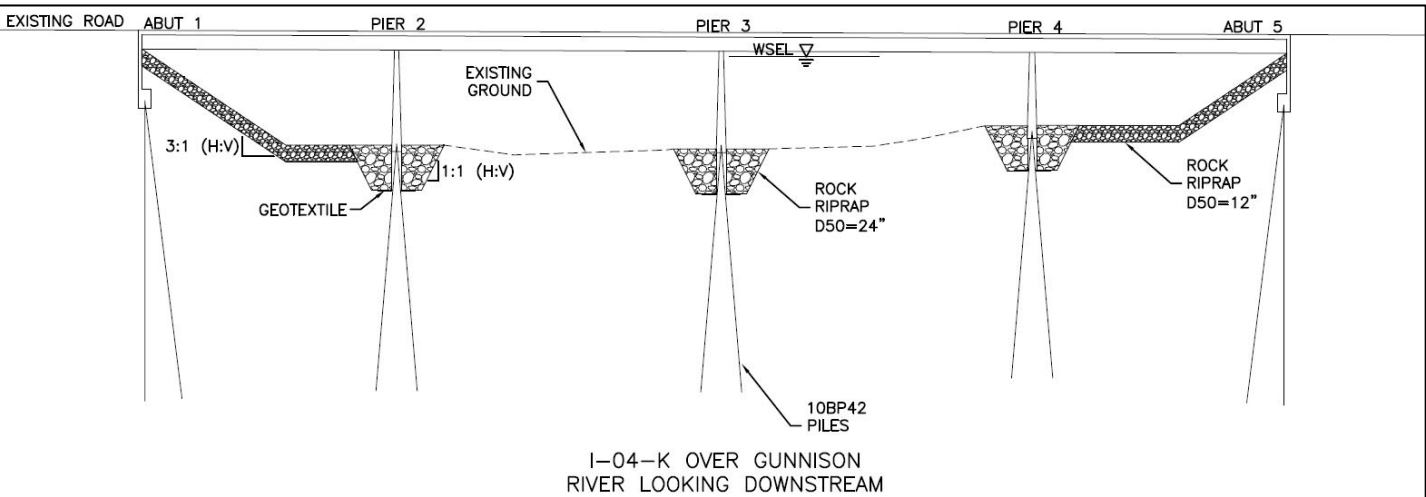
Cross-sectional view of Bridge I-04-K with recommended hydraulic scour countermeasures
